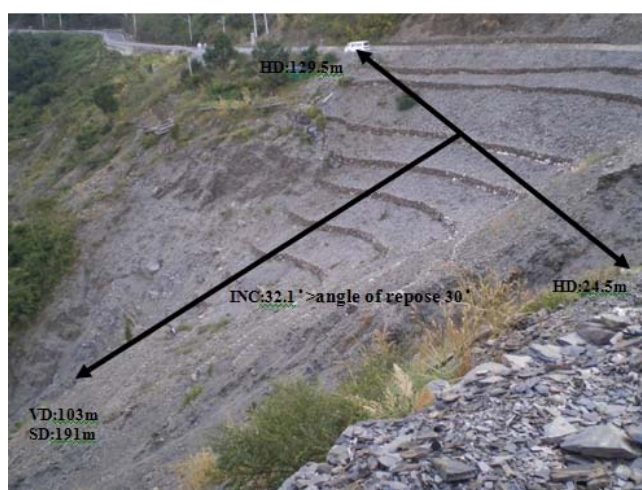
Ground Stratum of Lower Slope on Collapse Site
